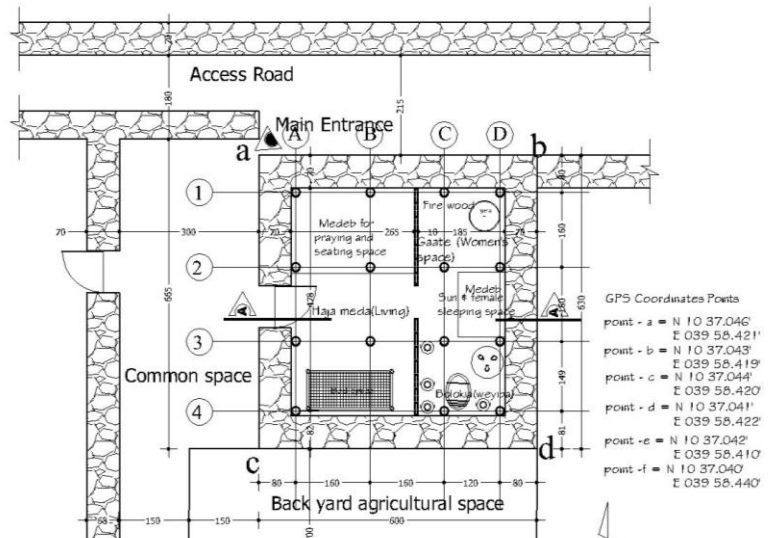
110 Floor plan and compound layout of W/ro Alima's compound
